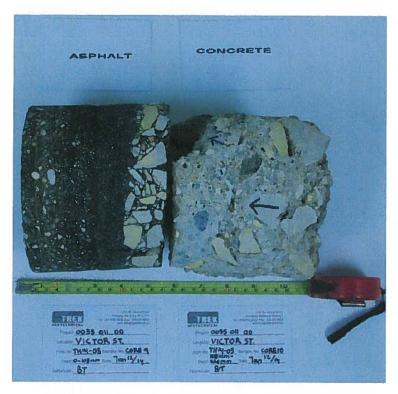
Asphalt and Concrete Core Sample from Test Hole TH14-05
